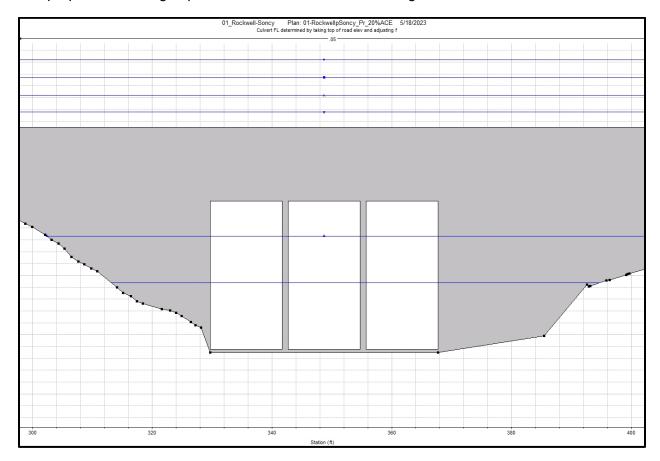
Proposed 20% LOS upstream cross section at West Rockwell Road crossing of Spring Draw.
